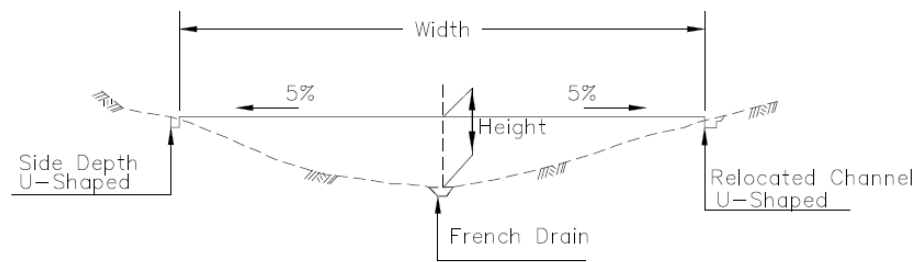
(c): Typical Arrangement for Spoil Banks: Cross Section of French Drain
